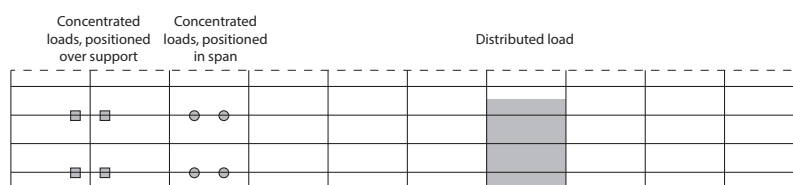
An example of how the concentrated loads was placed over one transversal beam, in one span between the transversal beams and how the distributed load was placed.
